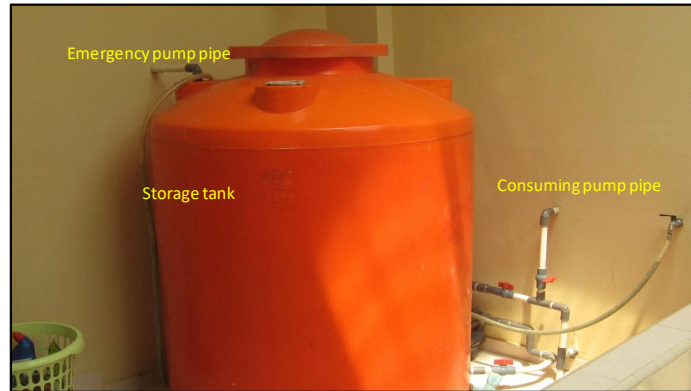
Storage tank, emergency pump pipe, and consuming pump pipe
